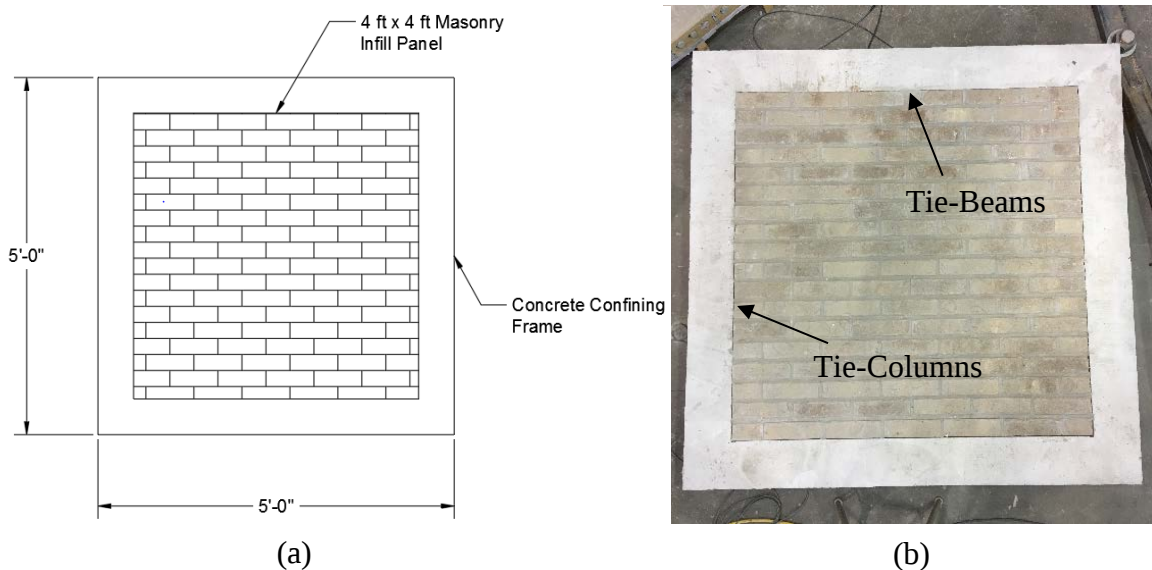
Plan view of the masonry infill wall as a (a) reference image and (b) post construction
